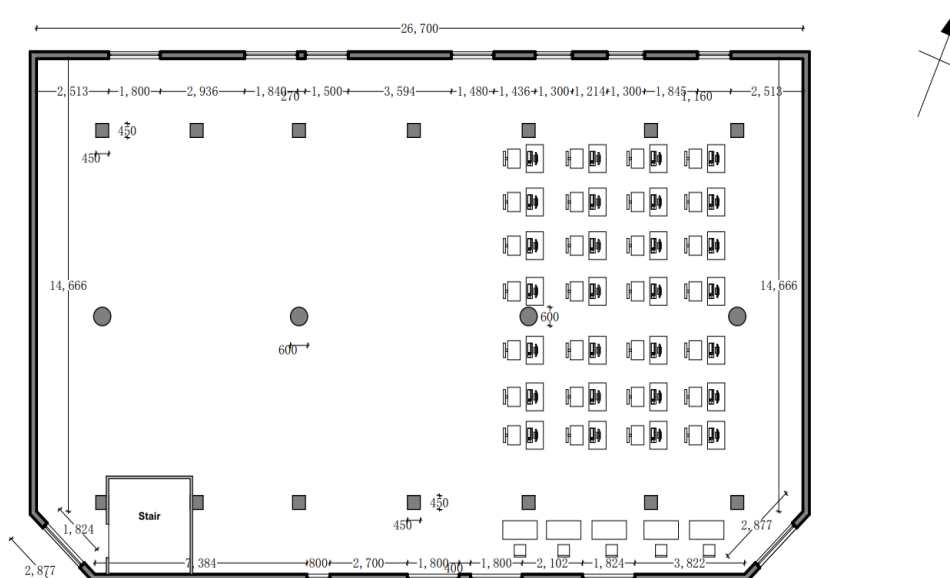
Floor plan of ESUT-HALL F (442 m sq, WFR = 8%) Source: Author’s fieldwork
